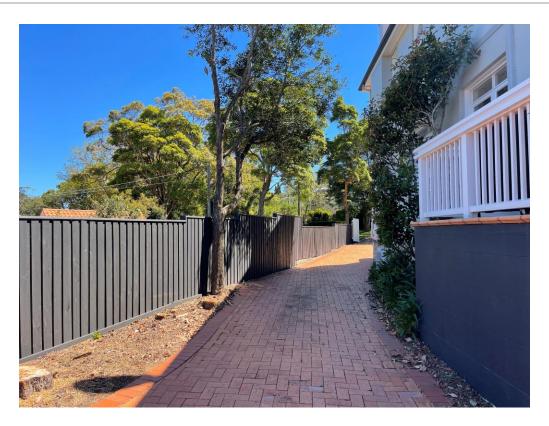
View of the existing access driveway to the garage, looking north along the western boundary
